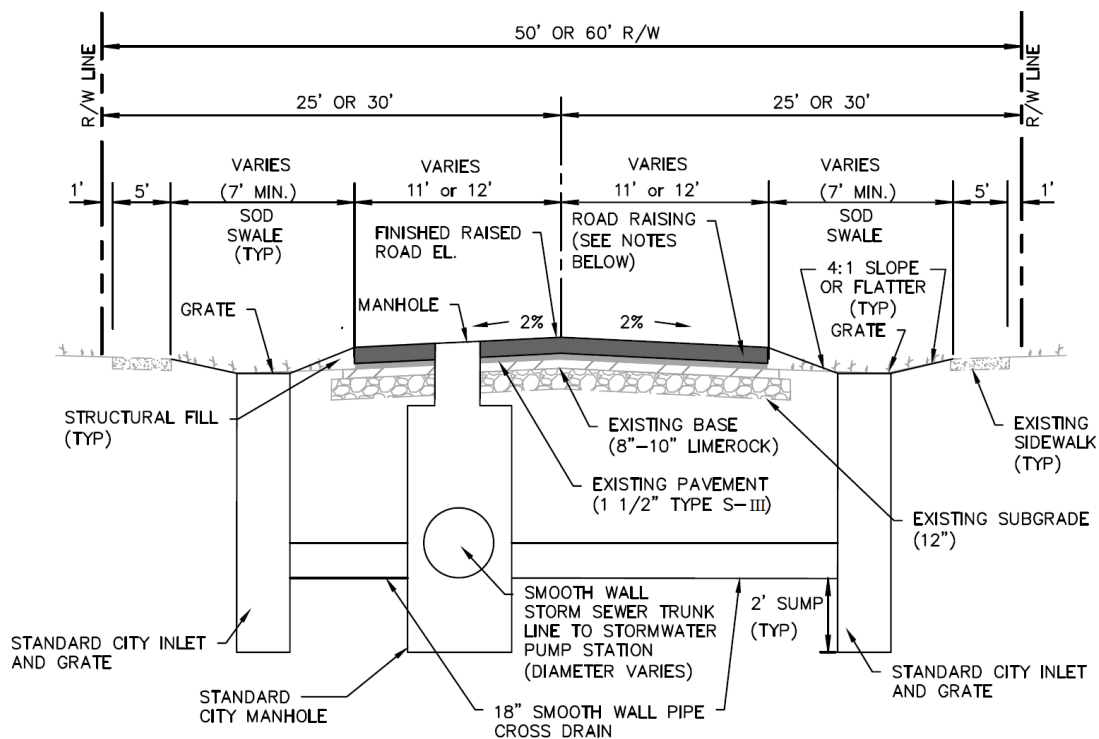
Raised Crown of Road and Added Drainage Profile
